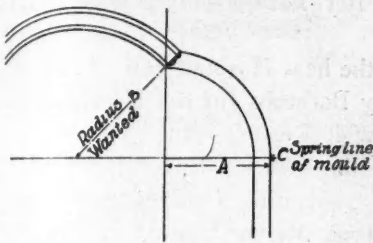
, Represents Mould to Be Bent Around Circle Door Heads.
